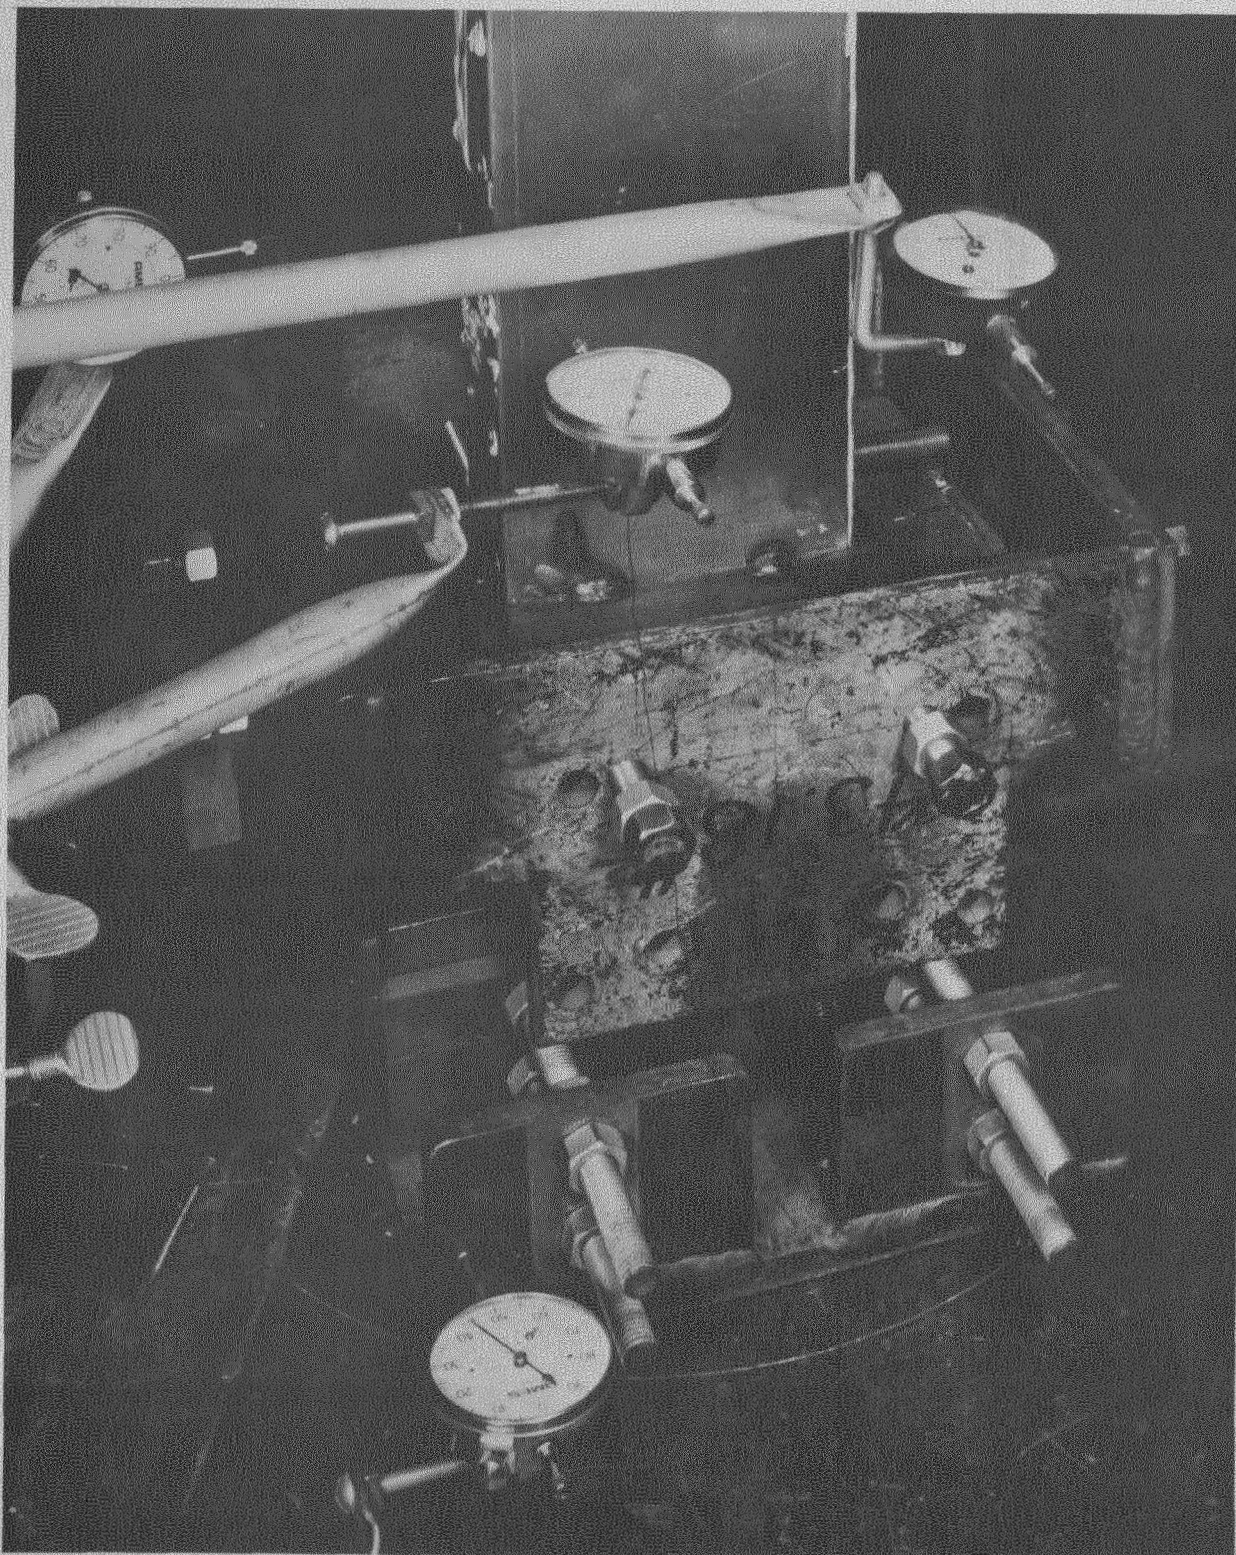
CLOSEUP OF LOWER PINNED-END FIXTURE
